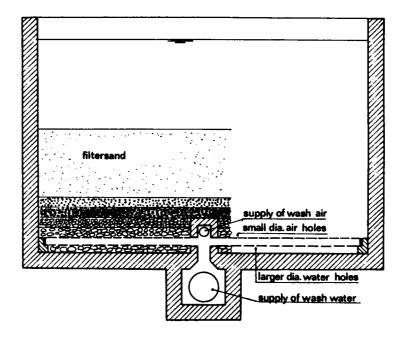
Perforated lateral underdrains for backwashing with water and air
